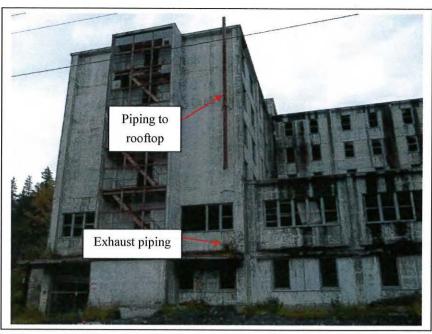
Presumed bakery and kitchen exhaust piping; looking southeast. (September 8, 2014)
